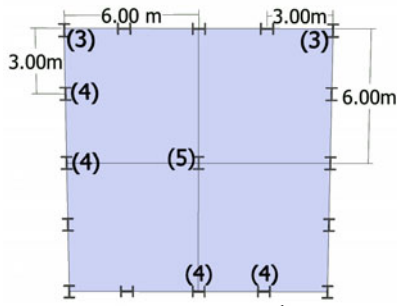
Plan view of twenty-story, 1860 member steel space frame
